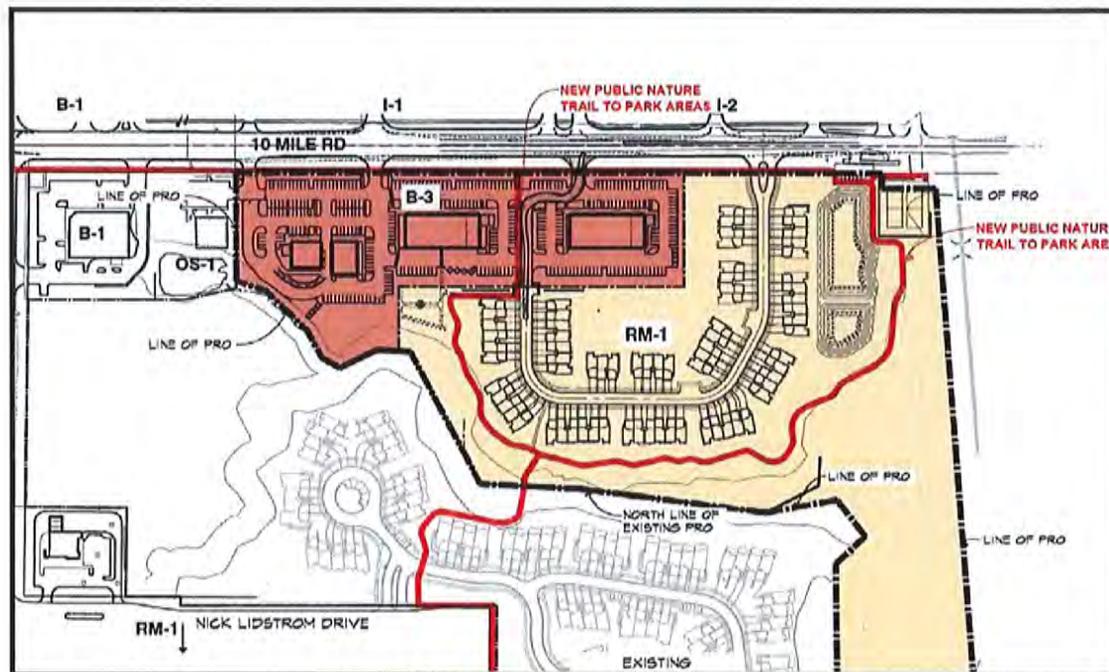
Novi / 10 PRO Concept Plan
